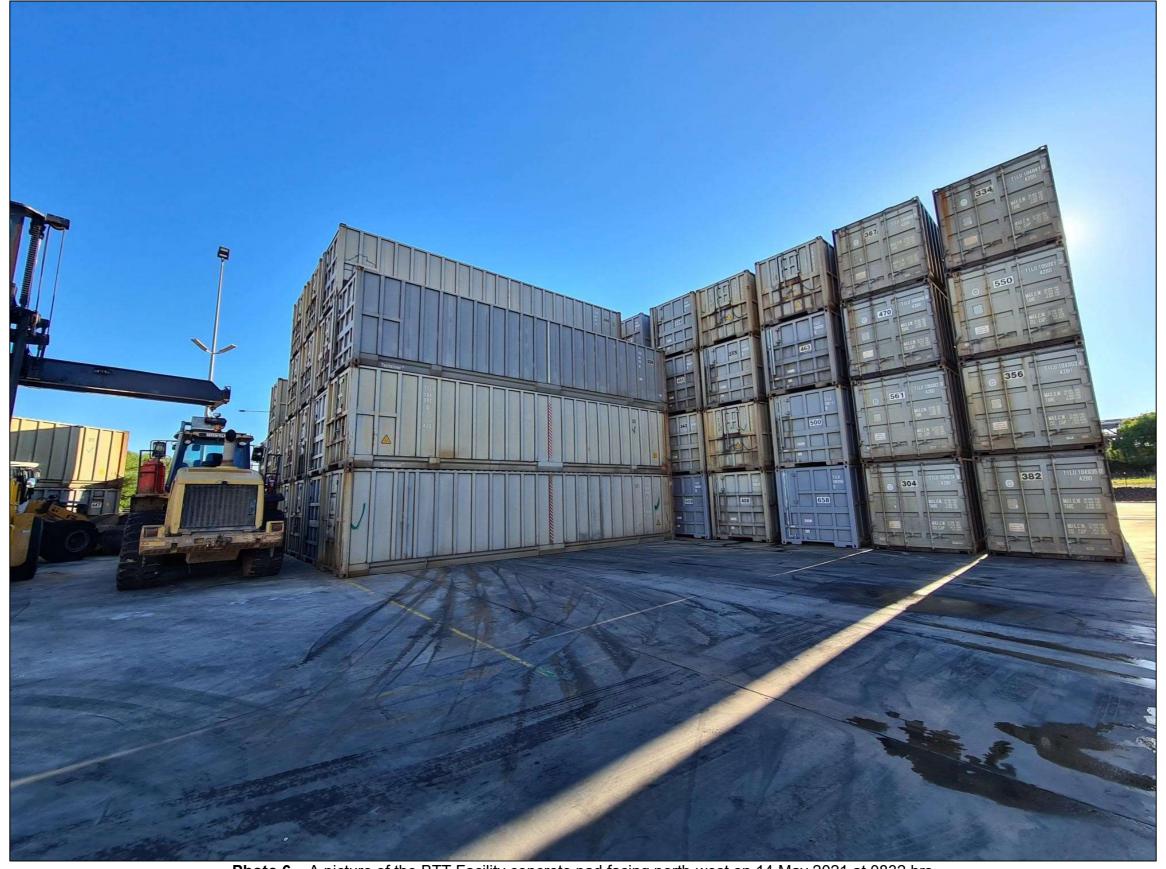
A picture of the BTT Facility concrete pad facing north-west on 14 May 2021 at 0832 hrs
